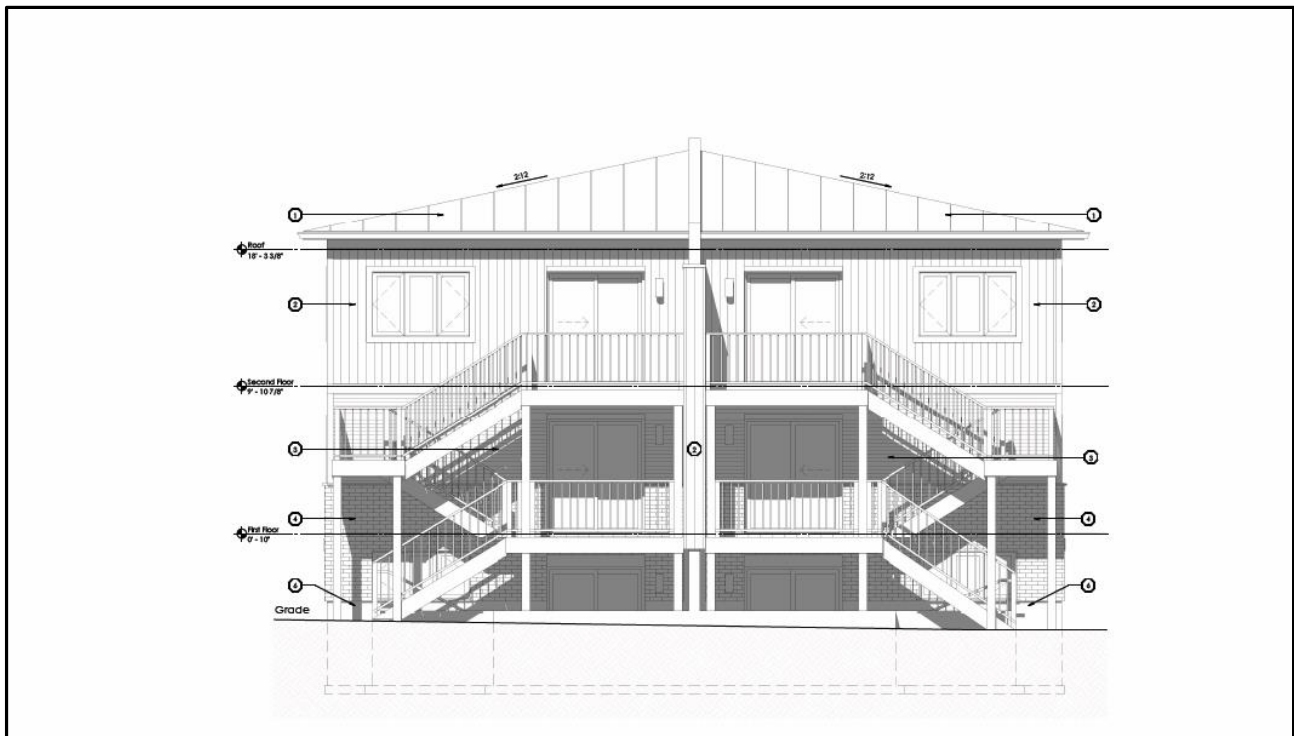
Proposed Rear View of the Semi-Detached Dwelling
